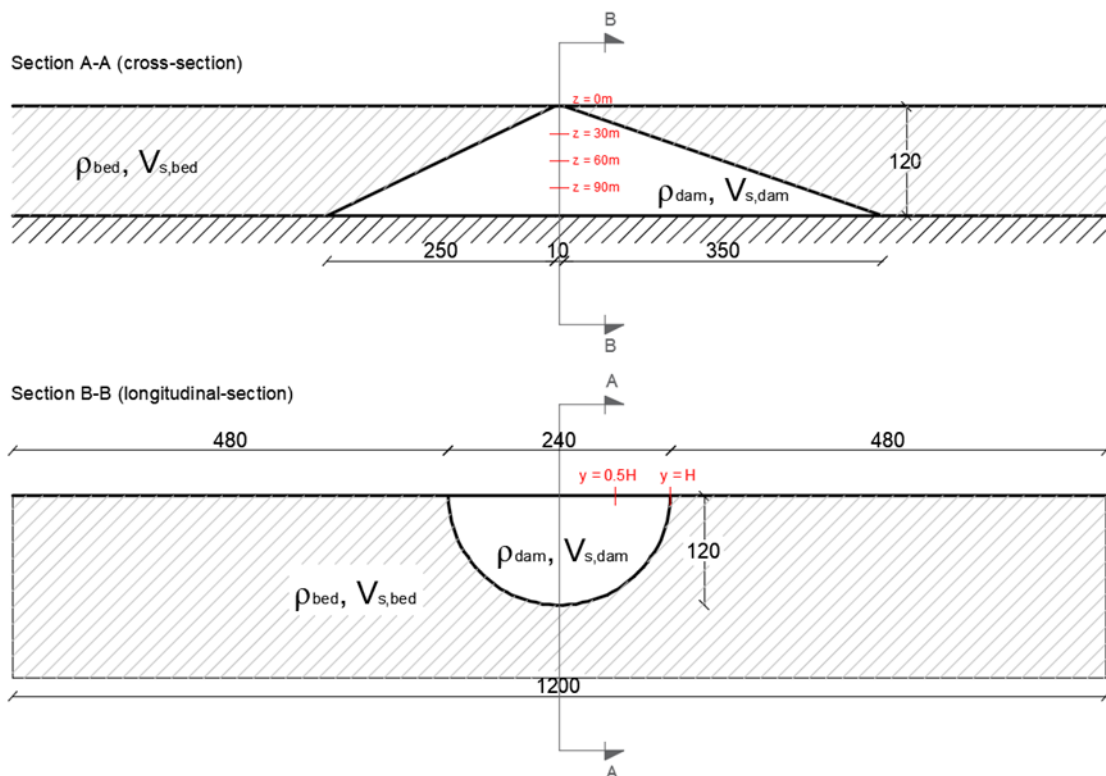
Semi-cylindrical earth dam. Above: cross-section; below: longitudinal section.
